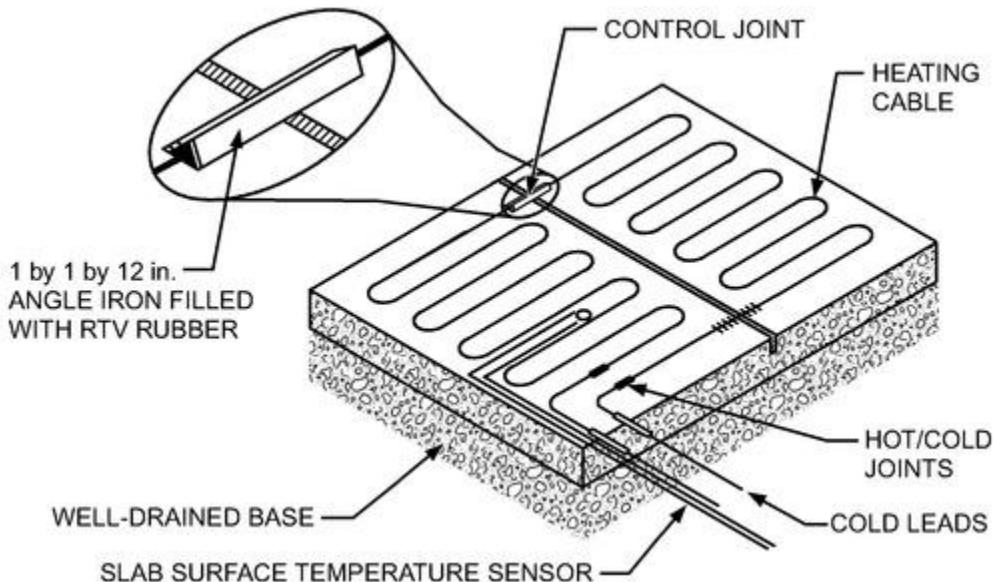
Typical Mineral Insulated Heating Cable Installation in Concrete Slab
